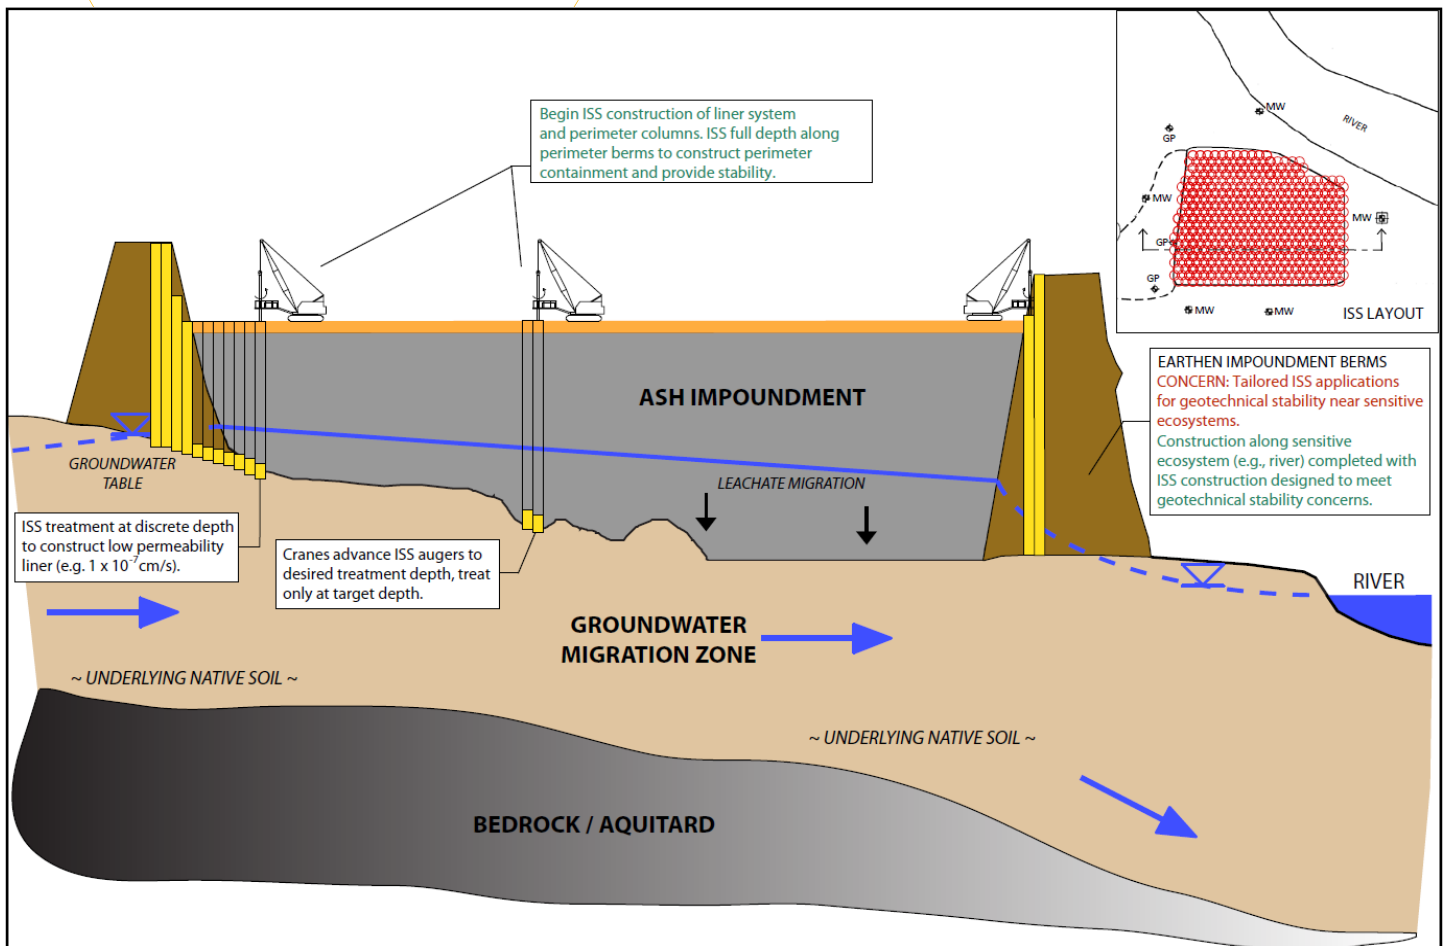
ISS construction of a horizontal liner at the bottom of the impoundment and perimeter vertical barrier wall.
